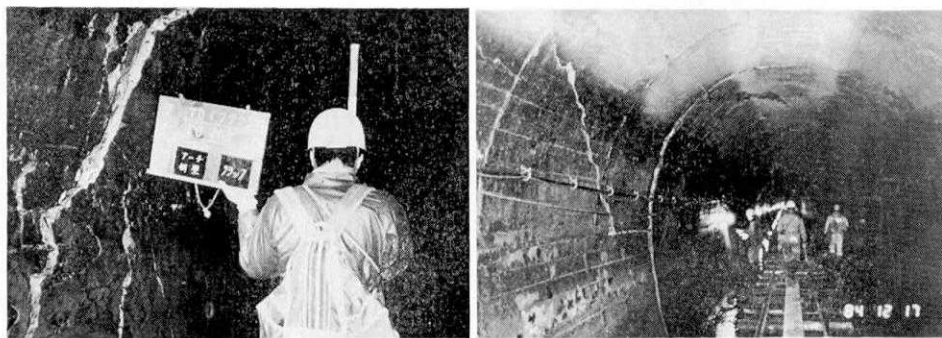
Cracks at Loc. A (6775 m from Otakigawa dam).
